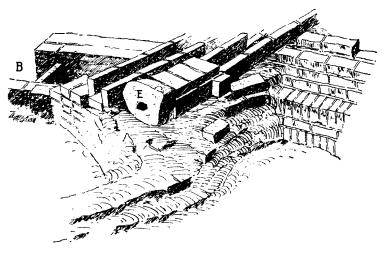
Late Roman Conduit E Crossing over Conduit B
